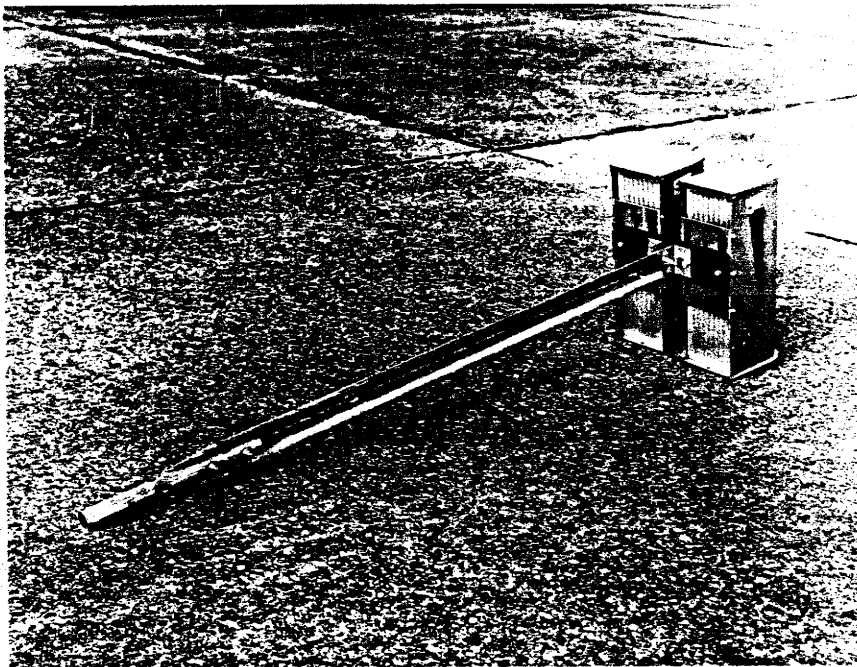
Test 3B Mailbox and Support Assembly Before Installation.
